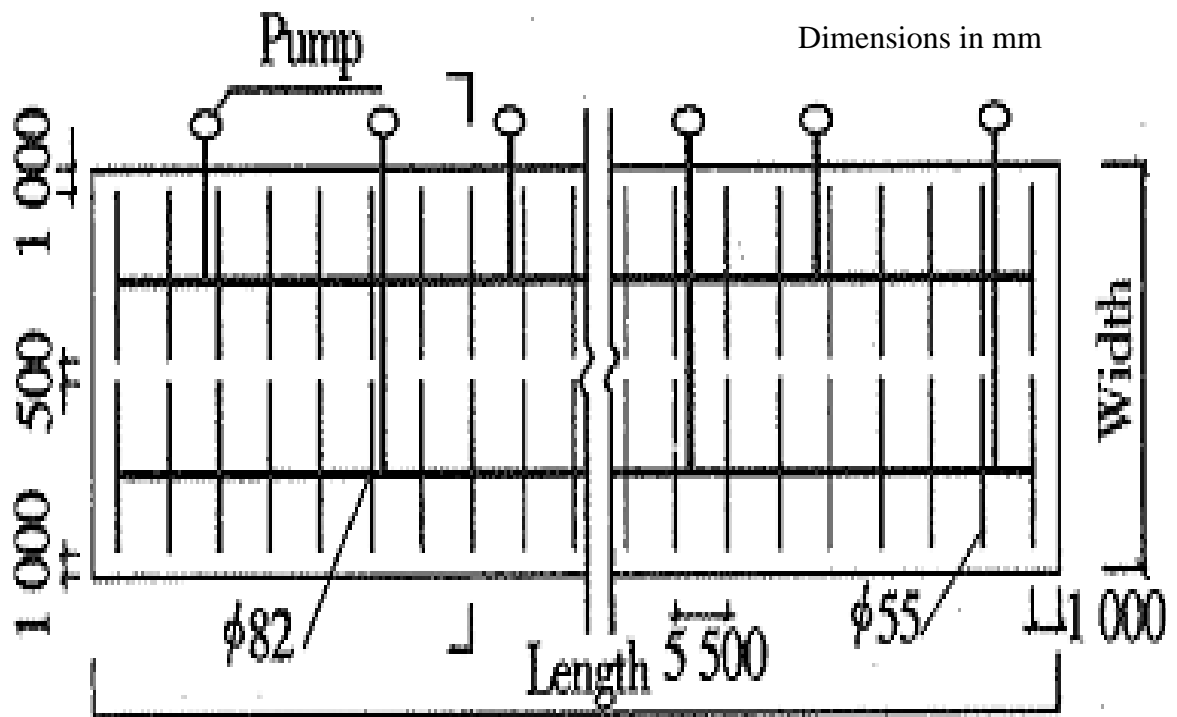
Layout of horizontal drainage network and its connection with vacuum pump (after Liu et al. 2004)
